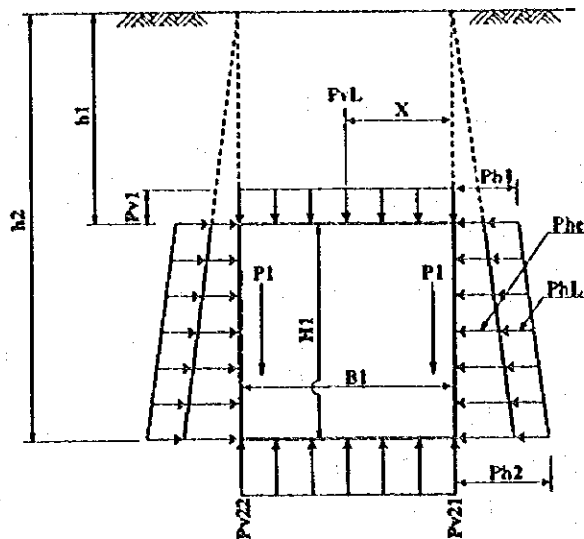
Design Load for Transverse Section of Sluiceway Conduit
